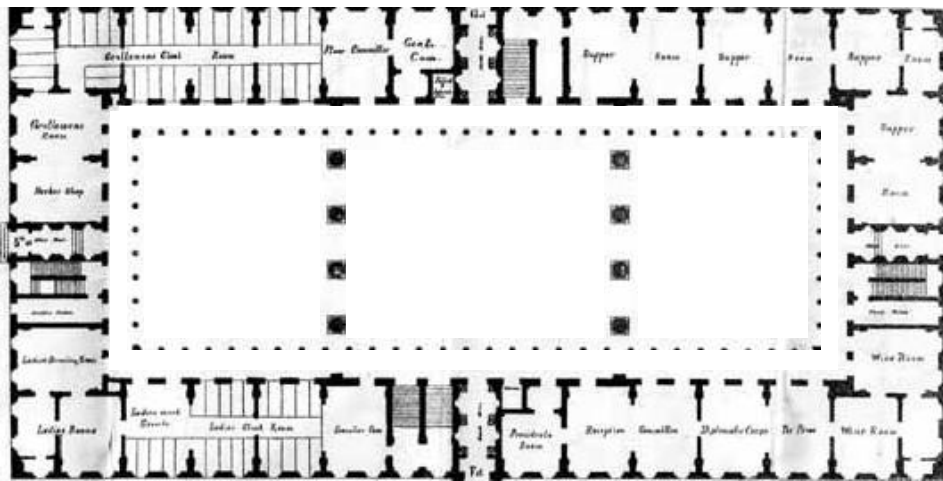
Plan and interior of Pension Building, Washington DC (Bednar, 1986)
